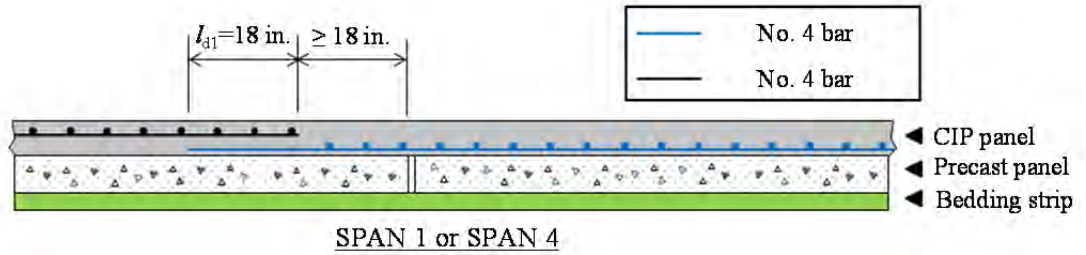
Details of longitudinal splices, Lampasas River Bridge (Sections A-A and G-G)
